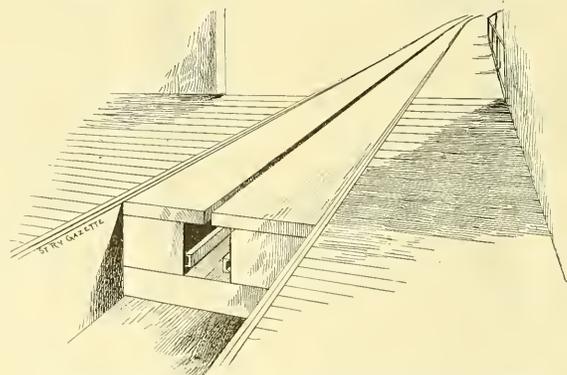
INTERIOR OF CAR HOUSE, SHOWING PIT AND CONDUIT.
